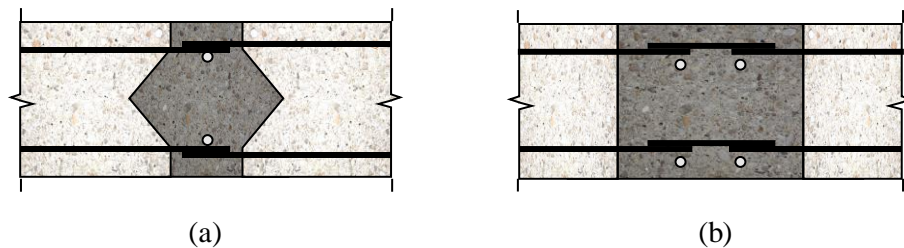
Joints with straight bar details; (a) typical joint geometry for UHPC filled joints and (b) typical joint geometry for joints filled with conventional concrete
